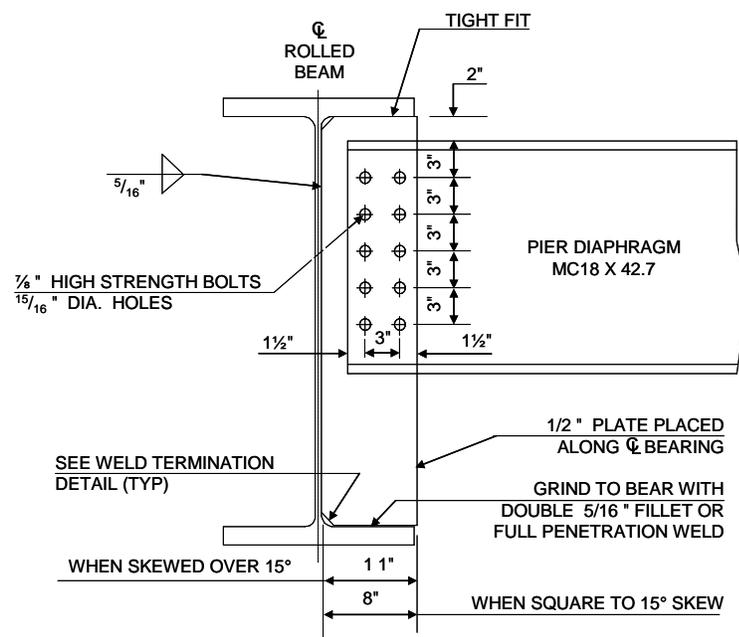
Pier diaphragms for continuous rolled beam bridges
